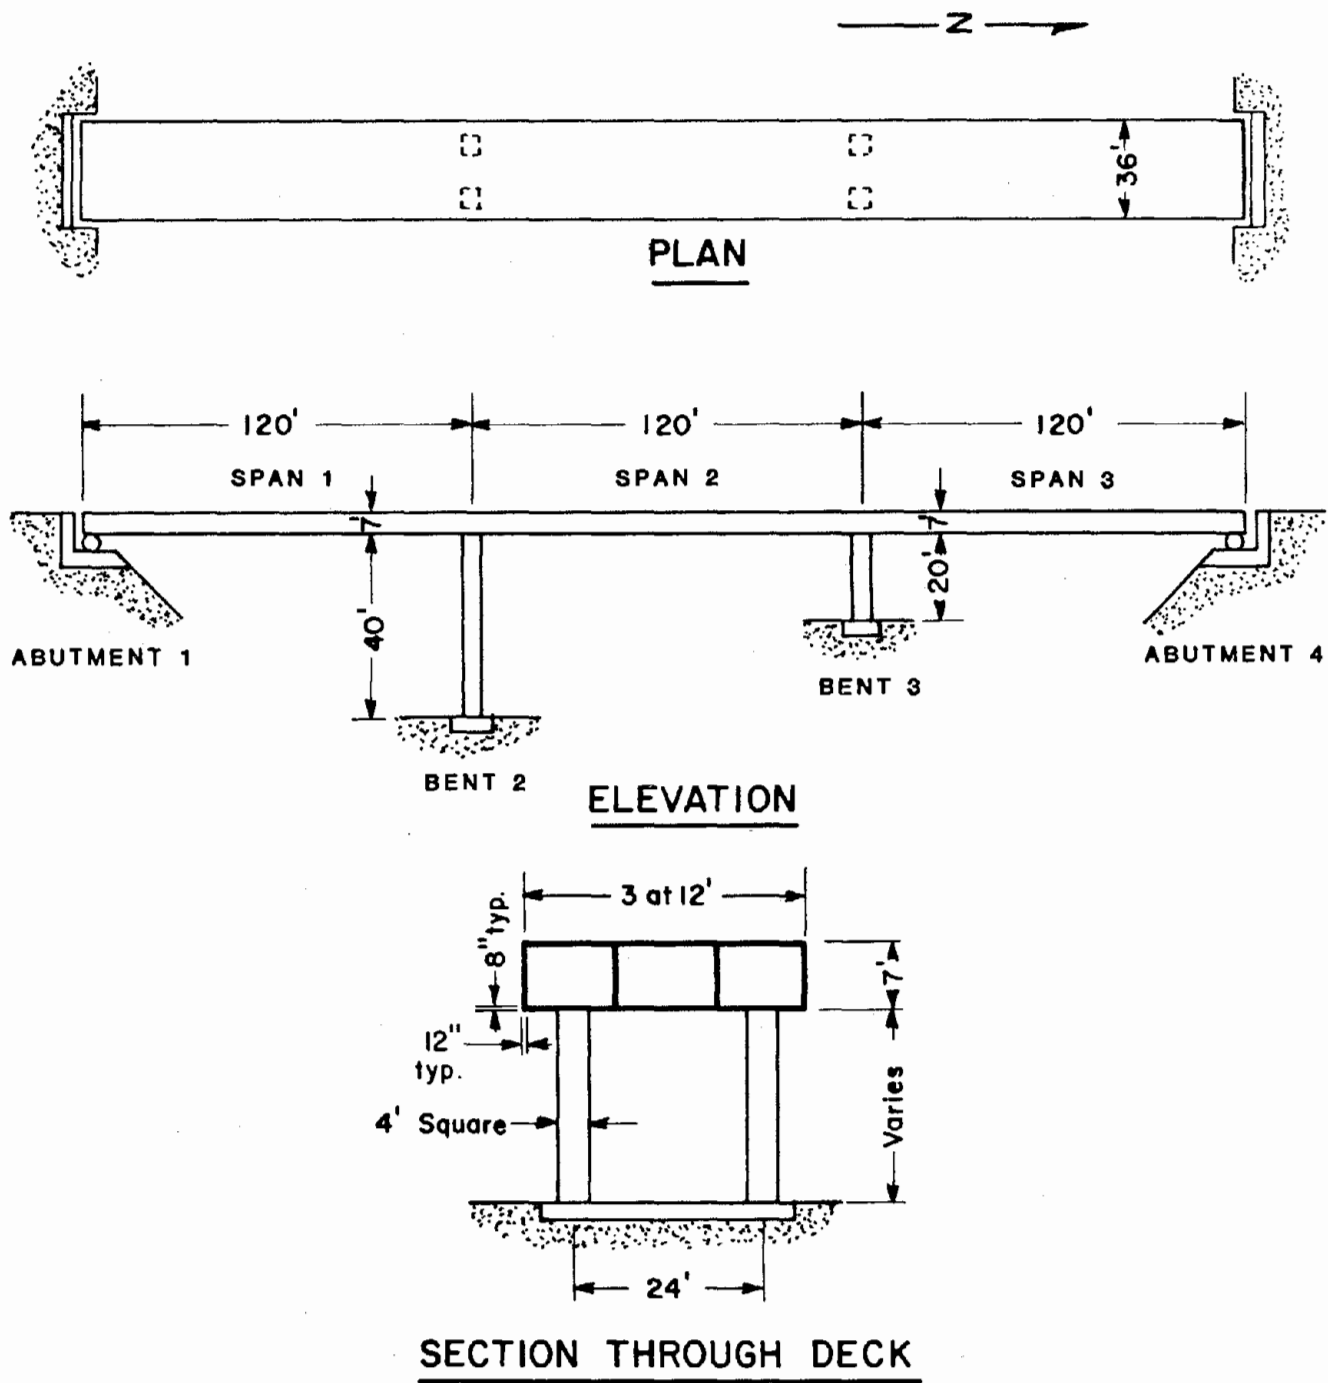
Continuous three-span bridge plan, section, and elevation views.
